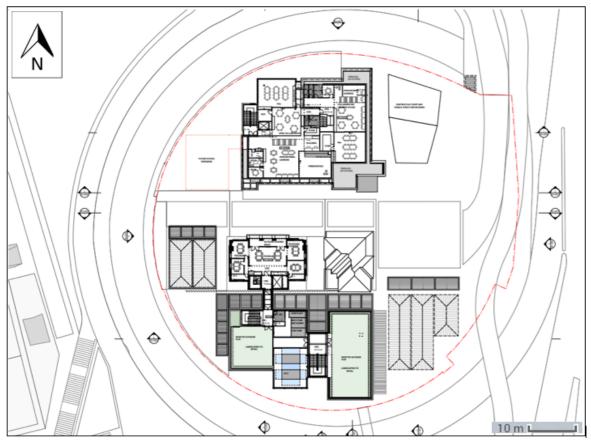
| Level 3 (second floor) (Source: Applicant's EIS 2020)
